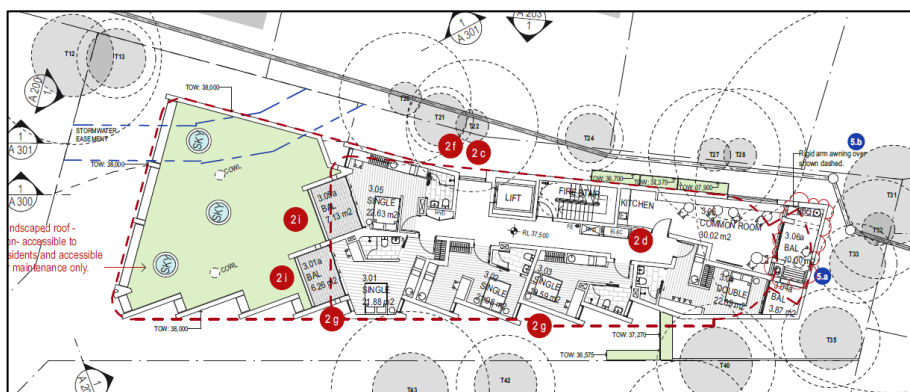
Proposed third floor plan (Source: TonkinZulaikhaGreer)
